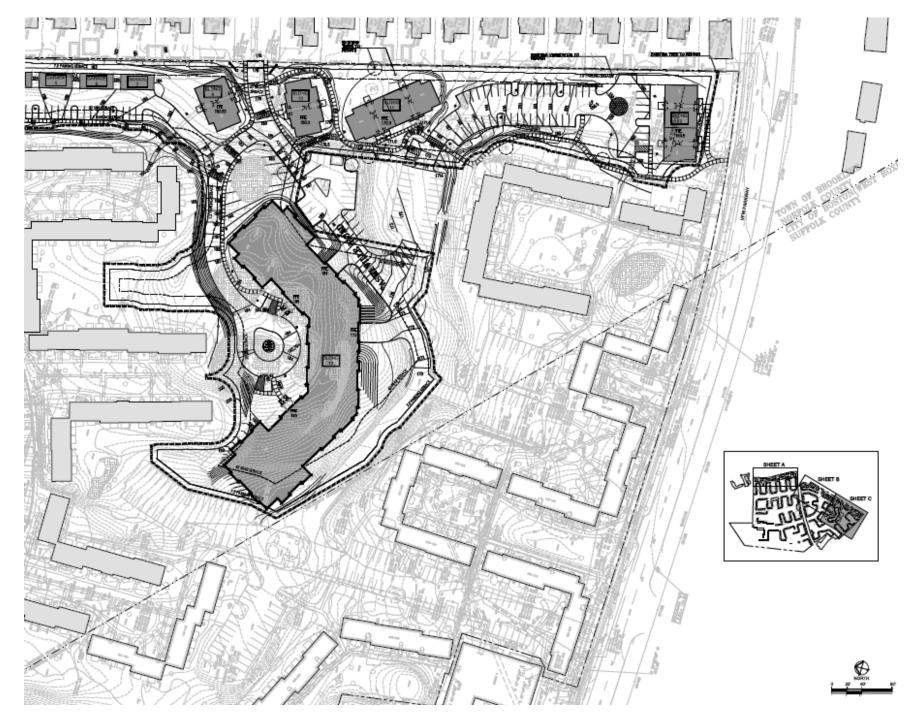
Site Plan Sheet C: Grading Contours, East Parcel, Apartment Building Source: Chestnut Hill Realty c.40B Proposal, June 10, 2013
